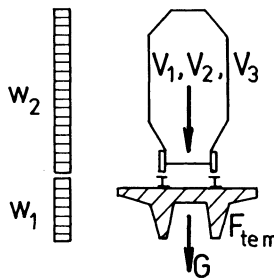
Example 3.2. Loads on a railway bridge.
